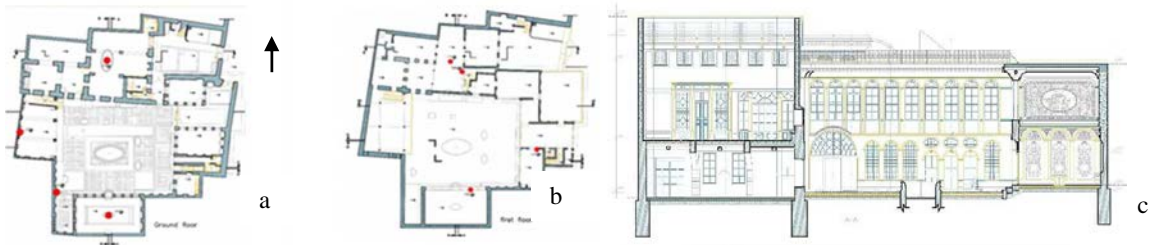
; BAIT FAKHRY AL BAROUDI. a; ground floor .b; first floor . c; section AA
